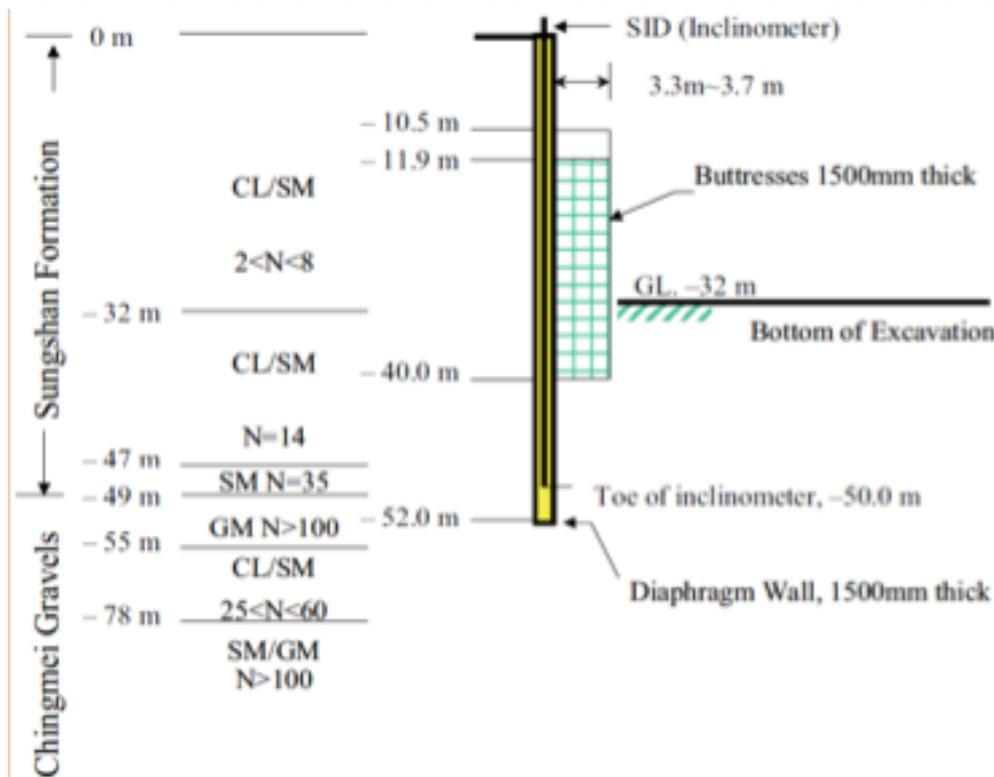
CPC Soil Profile with Depth and Diaphragm Wall
